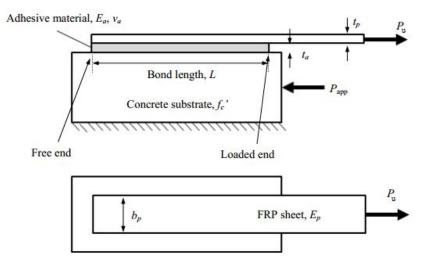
Single-lap shear test; a) Elevation; b) Plan form.
